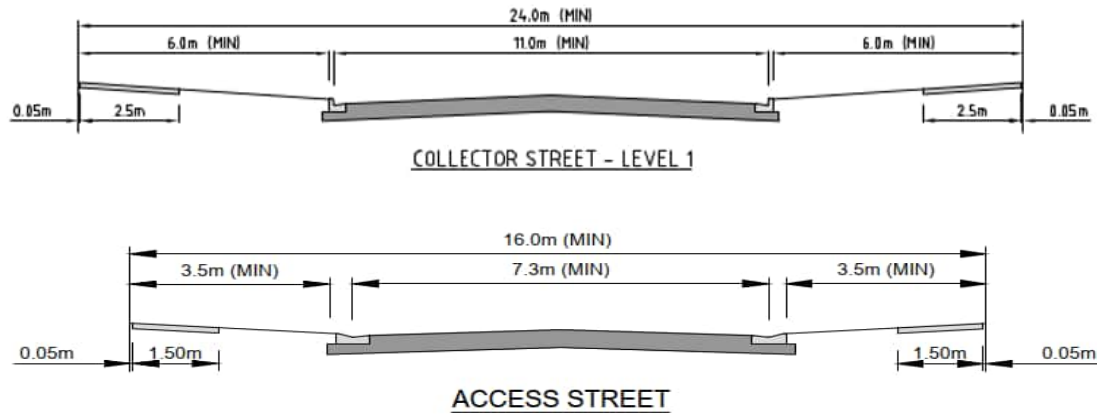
Road Profiles for Collector Street Level 1 (top) and Access Street (bottom) (IDM,2020)
